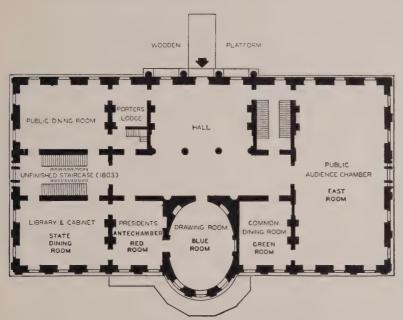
Plan of the White House ground floor in 1803. (From: "House and Garden").
